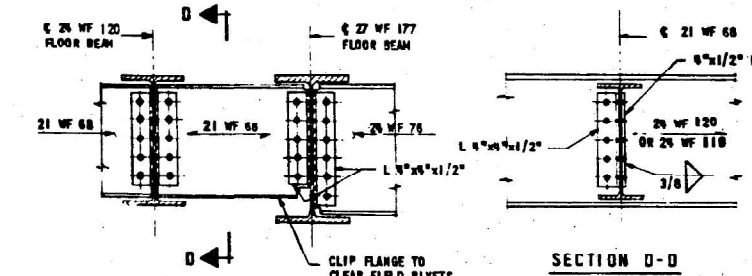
DETAIL OF GIRDER G1 AT NORTH ABUTMENT
